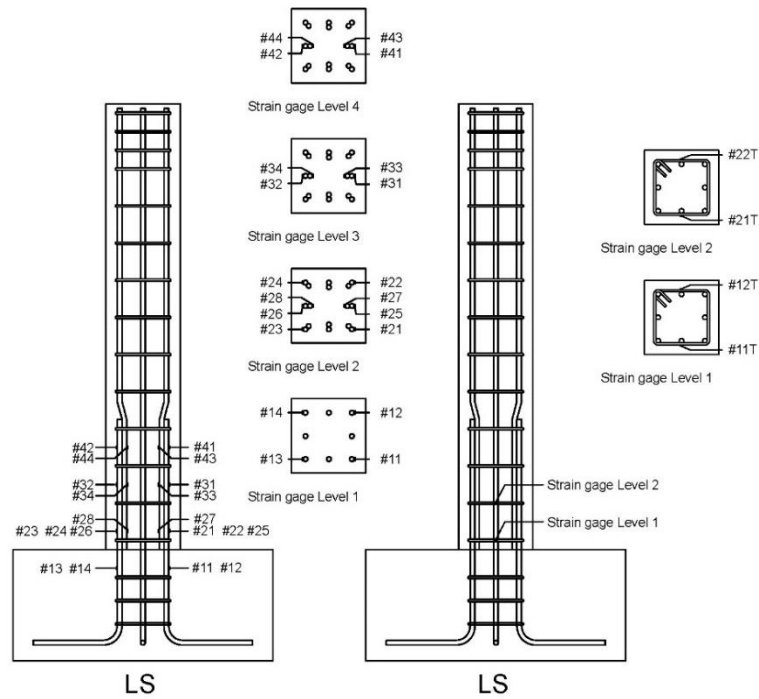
Detailing of strain gauge on reinforcements of LS column
